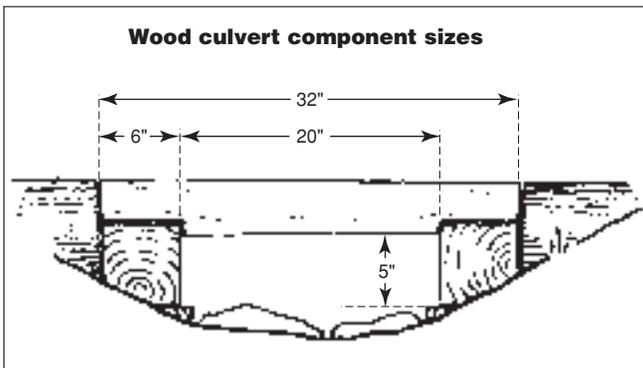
Minimum size recommendations for a wooden culvert designed to use standard timber sizes efficiently. Often larger culverts may be needed. This culvert has no constructed invert.
